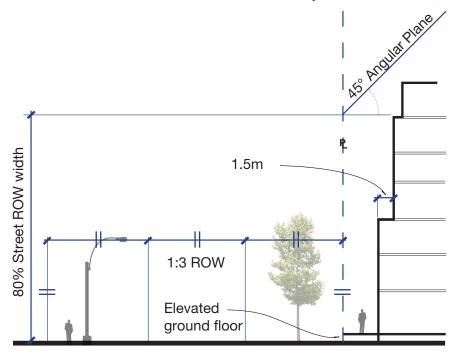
Illustration of Typical Residential Cross Section - Residential Ground Floor
